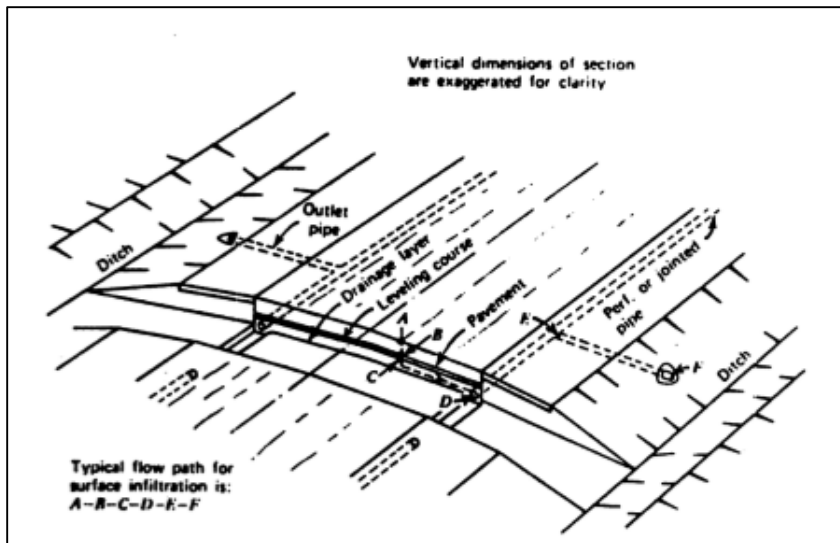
Typical Pavement Subsurface System (Hare, 1990)
